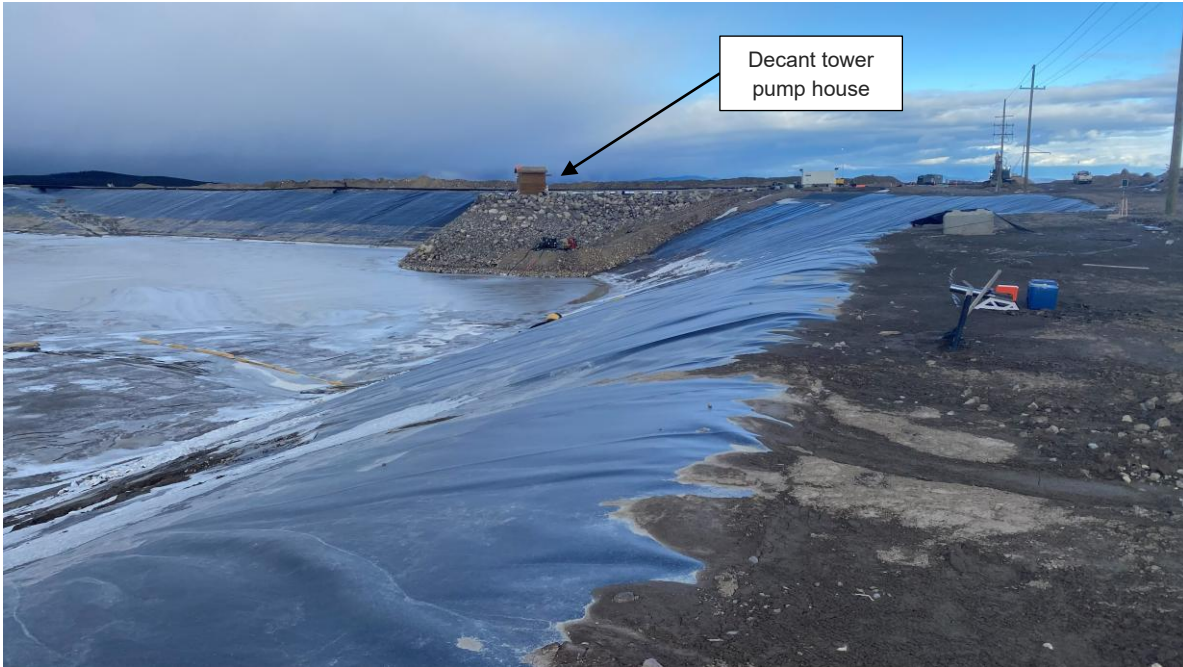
Upstream slope of East Berm and decant tower causeway, looking north (Photo taken on October 13, 2024)
